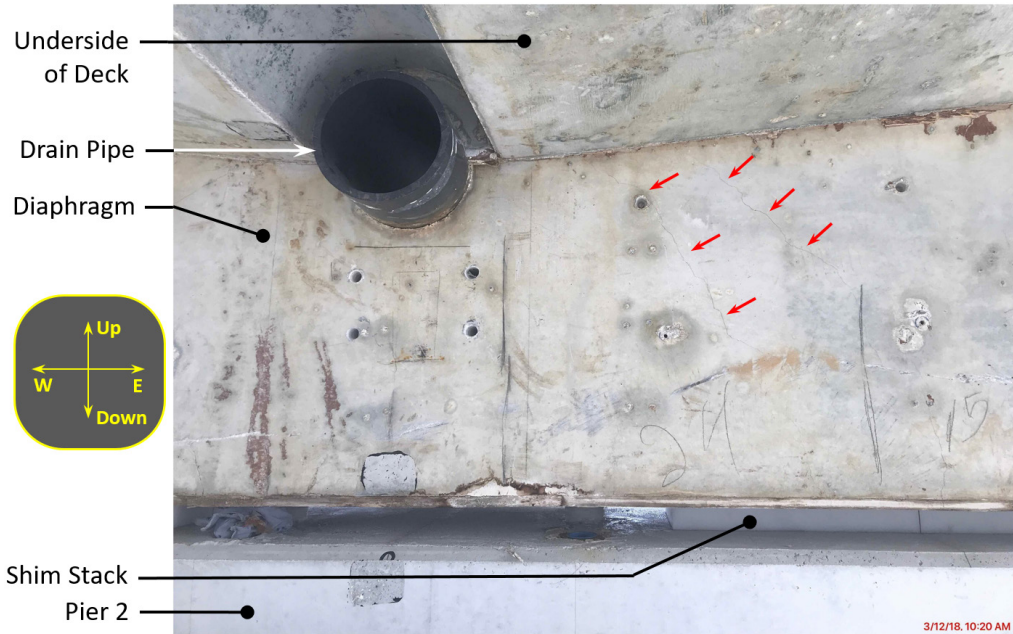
Photograph showing the south face of the north diaphragm between the midline of the bridge and the first bearing pad toward the east on March 12, 2018 at 10:20 a.m. Corresponds to Bridge Factors Factual Report Photo 70.
